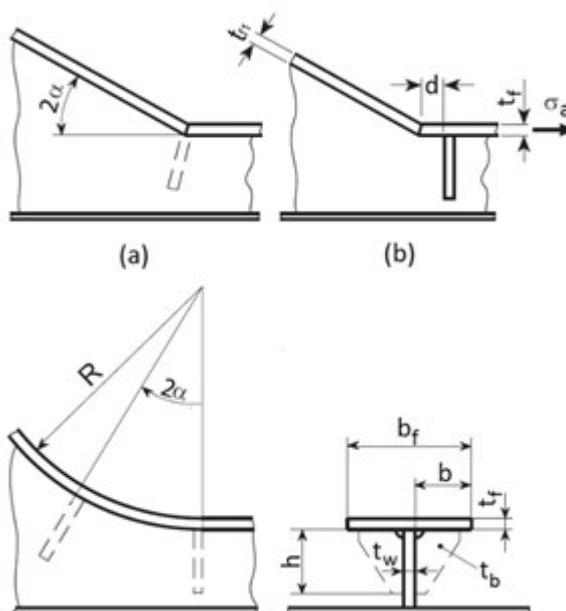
Typical stiffeners of rounded or knuckled face plates
